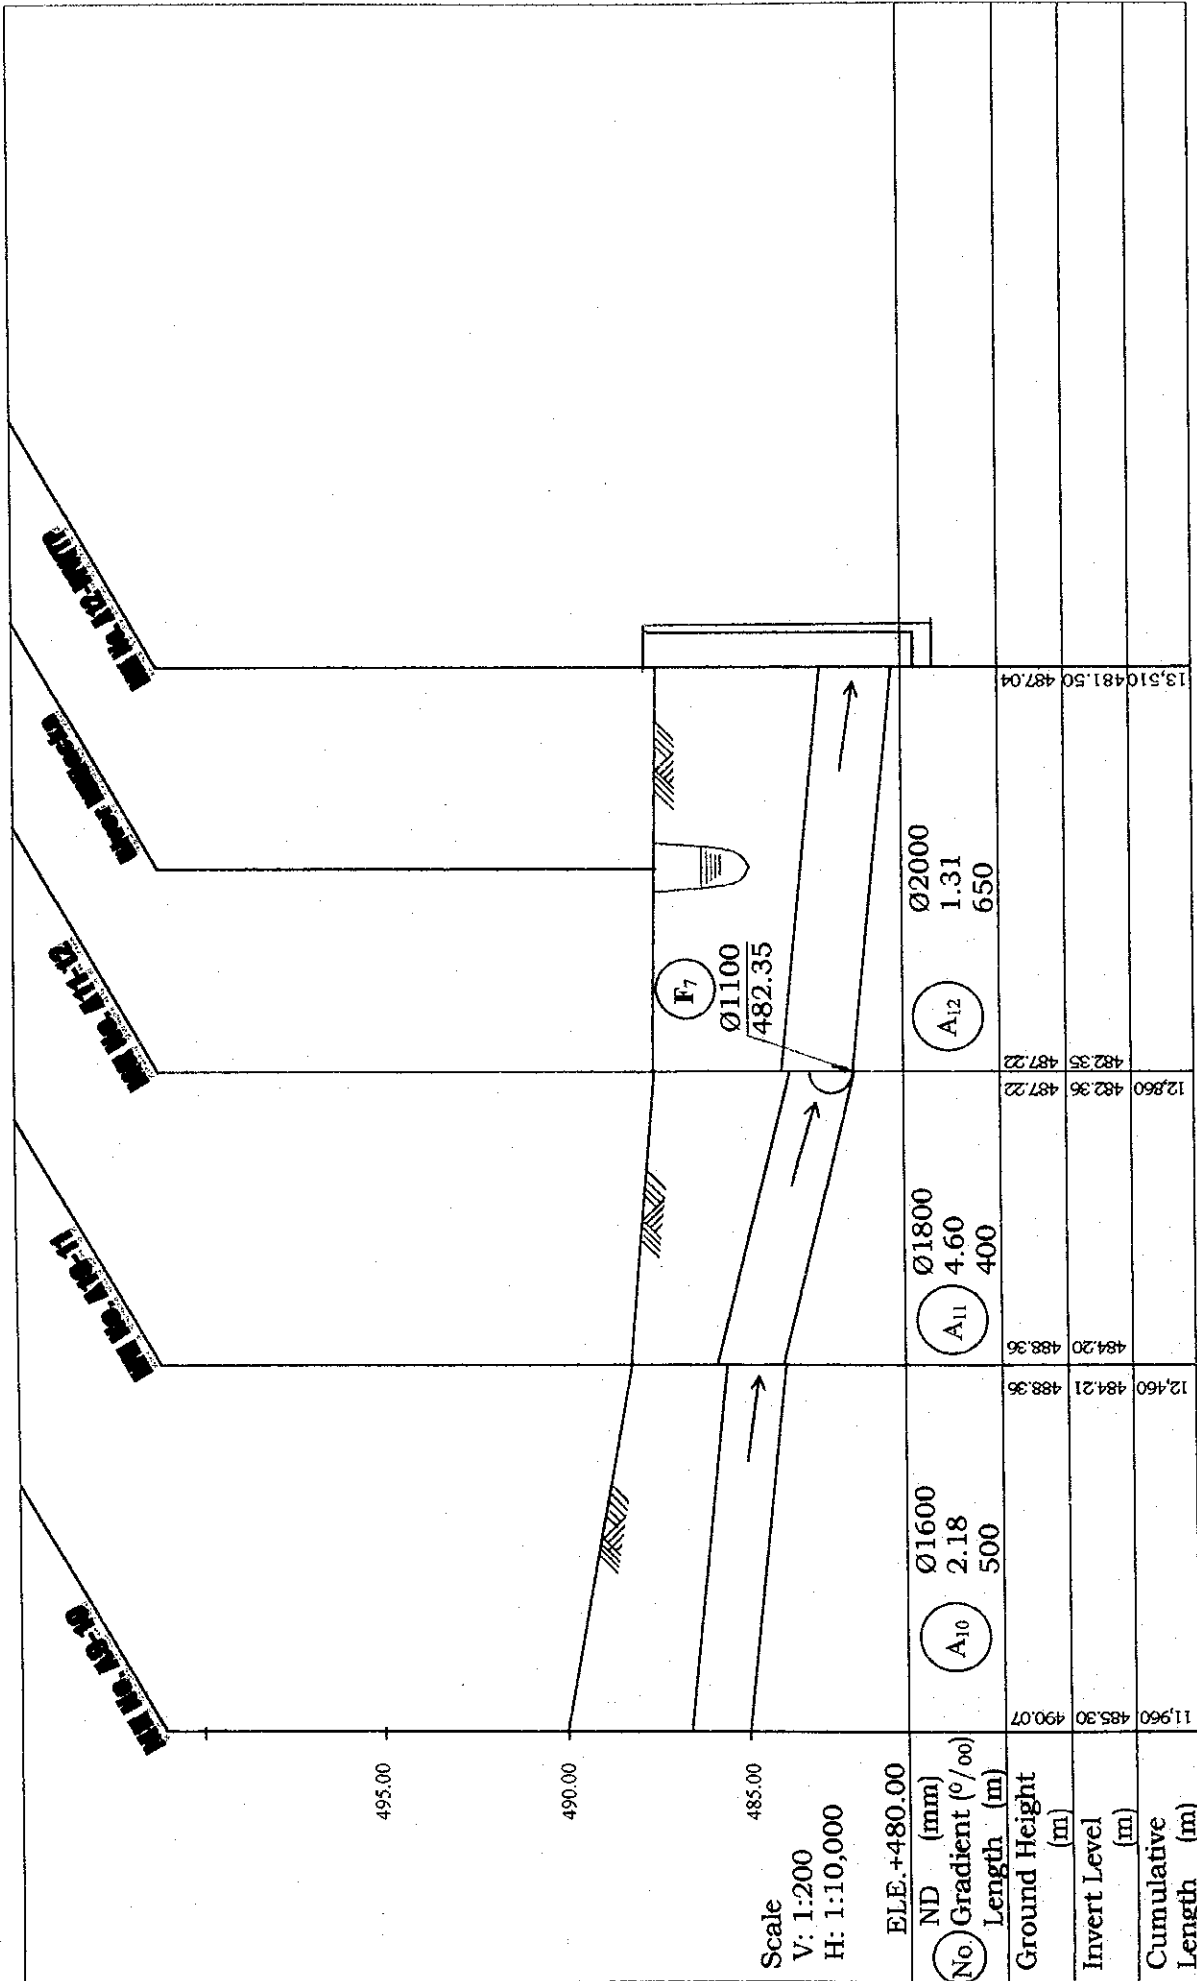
FIGURE LONGITUDINAL PROFILE FOR TRUNK SEWER - B
